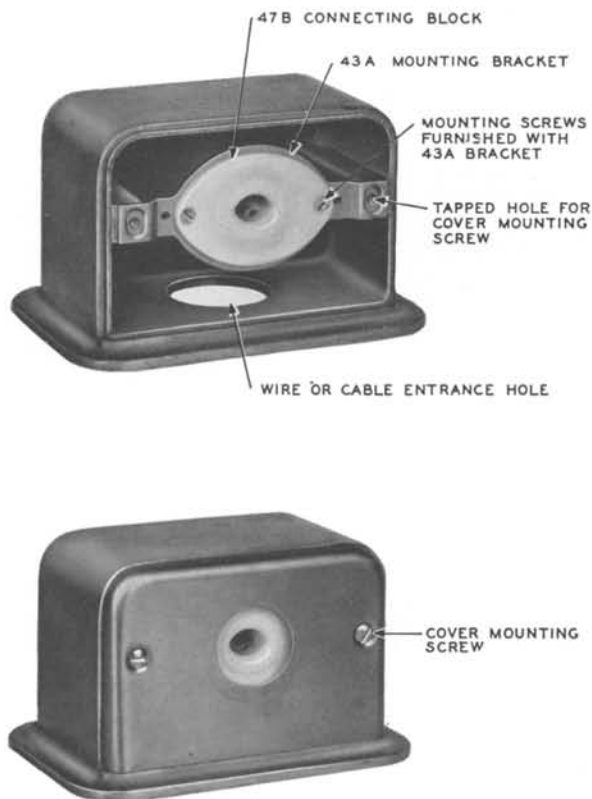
EXAMPLE B—47B CONNECTING BLOCK MOUNTED IN FITTINGS OF UNDERFLOOR DUCT SYSTEM
